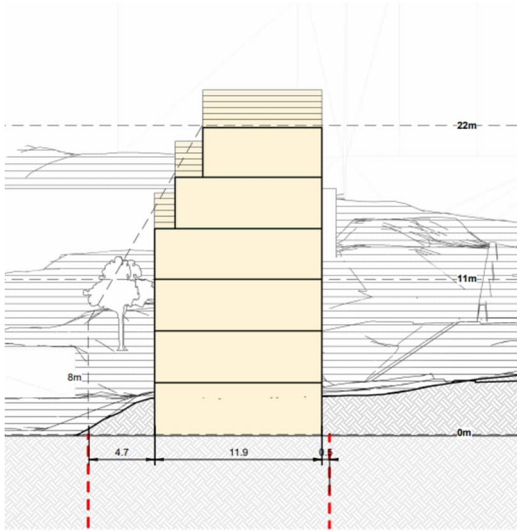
Cross section through site looking east towards Mt Victoria town belt.
